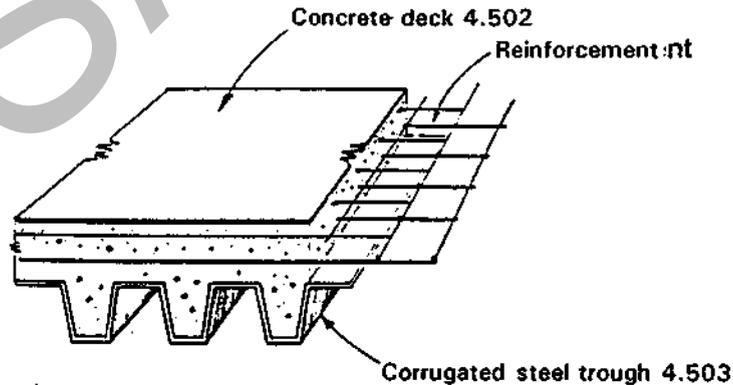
Corrugated Steel and Concrete Slab Decking
